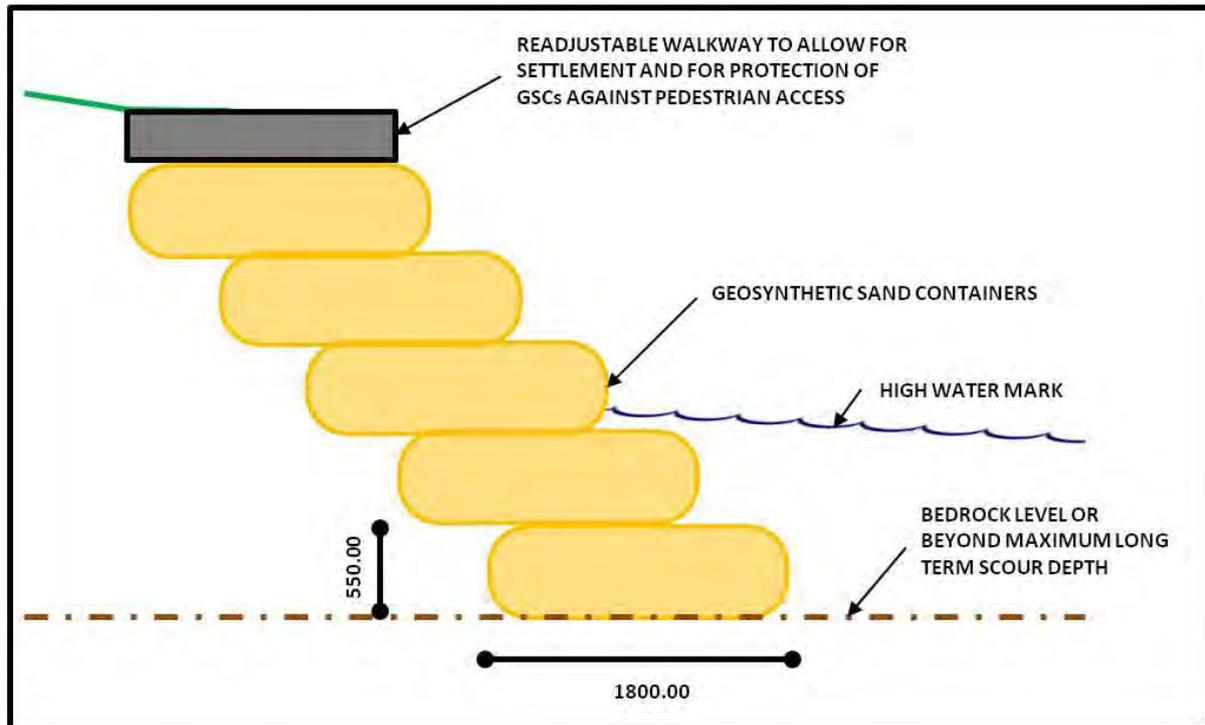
Design proposal 1 for the proposed Melck Street walkway: Geosynthetic Sand Container wall. Source: Common Ground Consulting (2013b).
